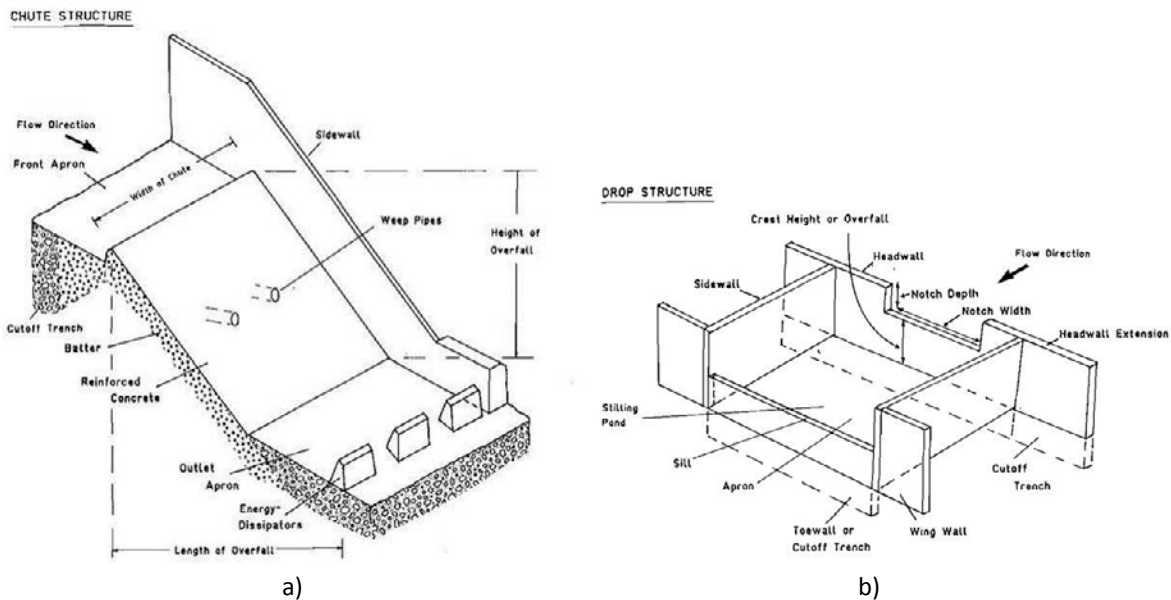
Generic design examples of a) chute structures and b) drop structures used to safely route overland runoff over a gully headcut (from Crothers et al. 1990).
